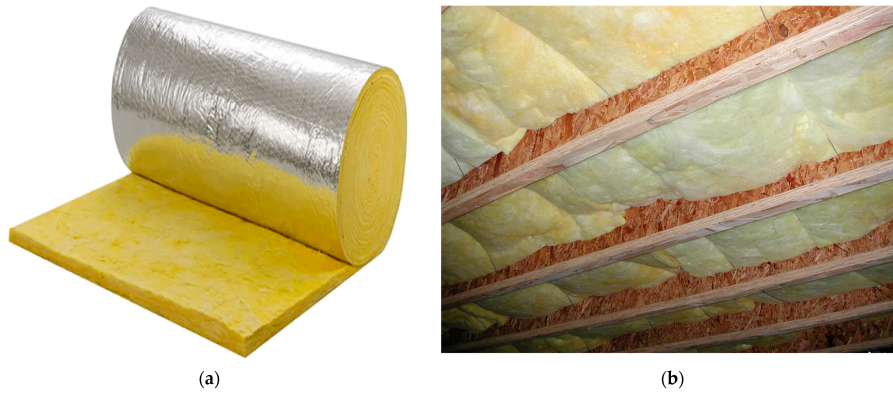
Example of glass wool as a thermal building insulation material and its application to building panel insulation (Ali et al., 2024)
